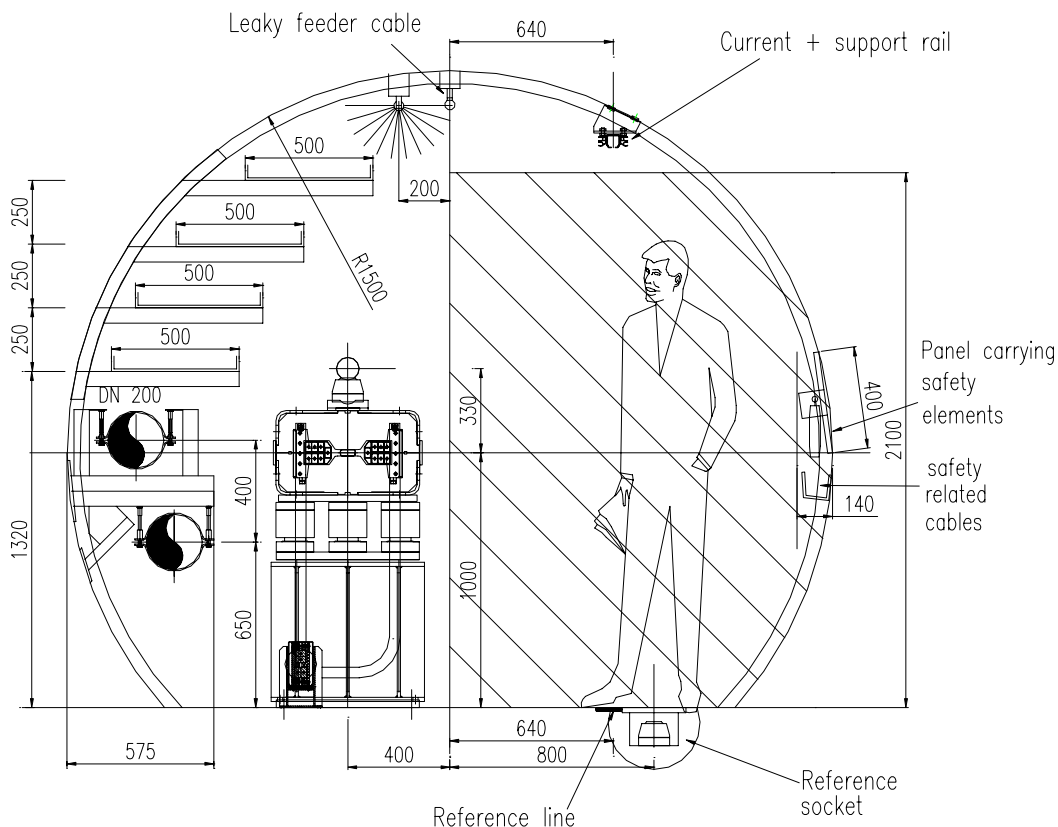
A typical TI 8 cross section, the hatched surface indicating the reserved space for transport.
